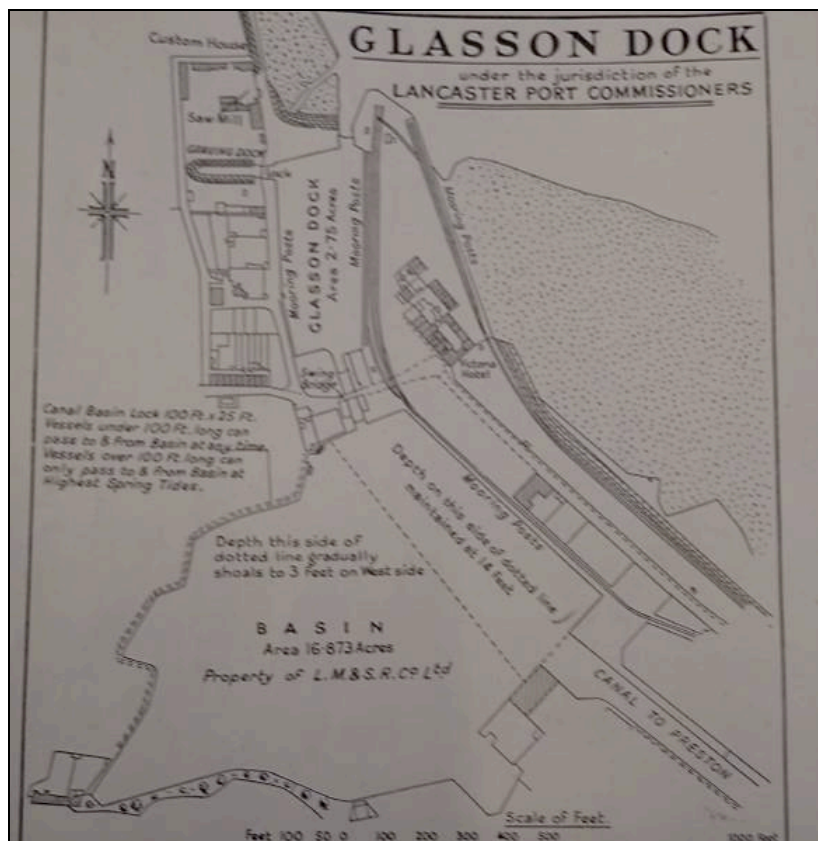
Plan of Glasson Dock (after Shaw 1945, 122)
